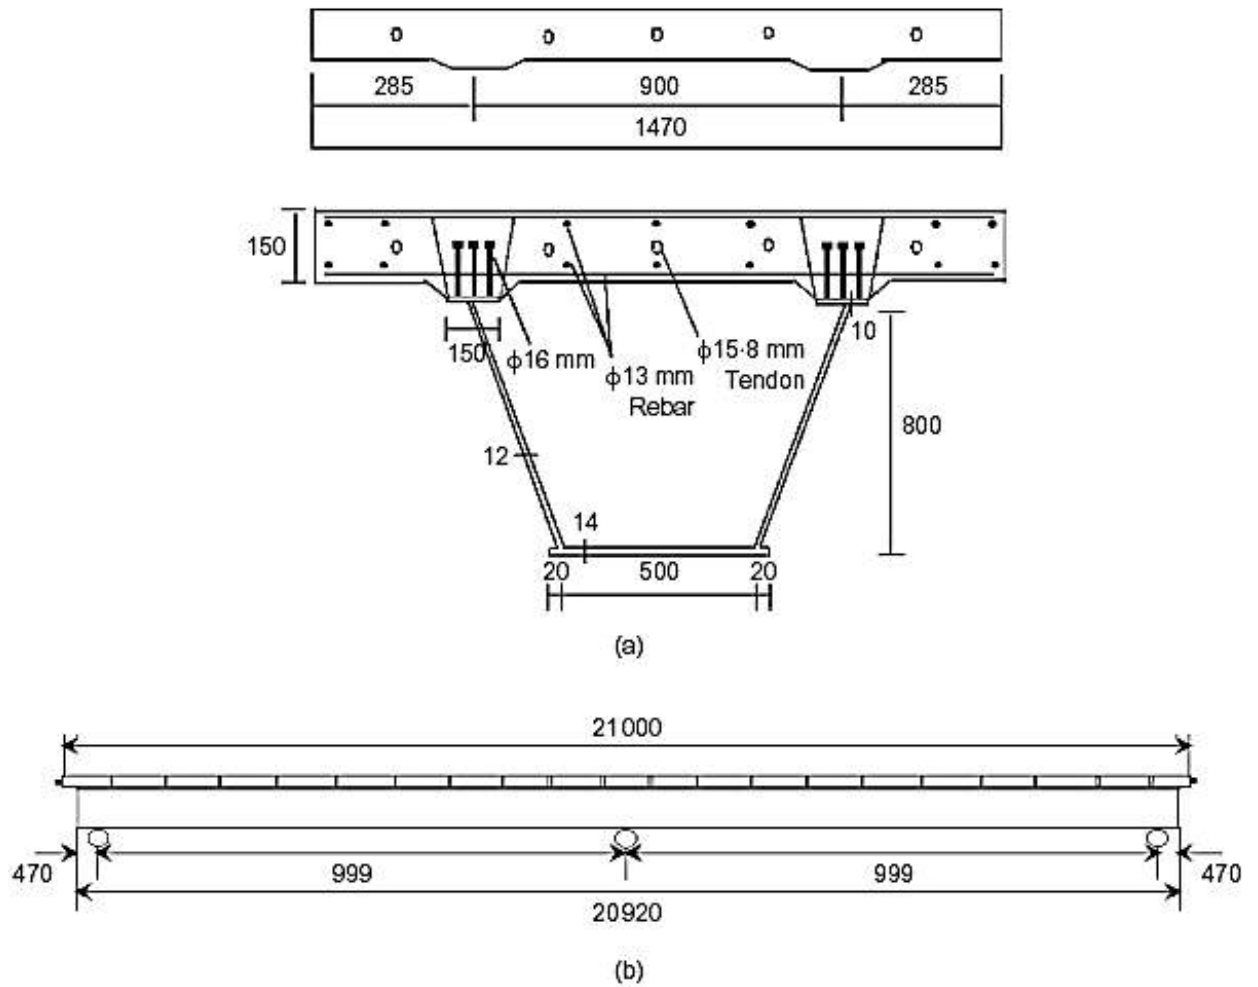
Continuous bridge model: (a) cross-section; (b) plan view (in mm) [20].
